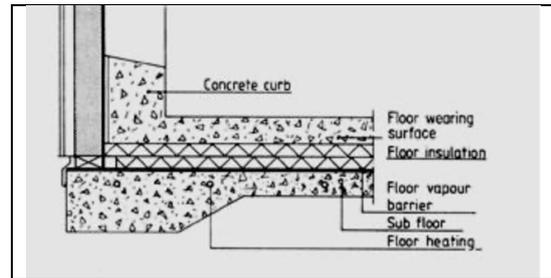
Construction of the buried sub-floor structure of your sub-zero floors¹²
